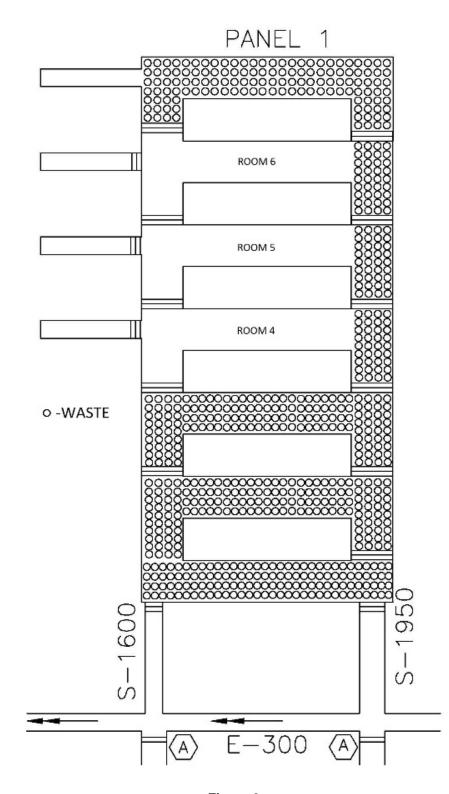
Panel 1 Showing Waste Emplacement and Abandoned Rooms
